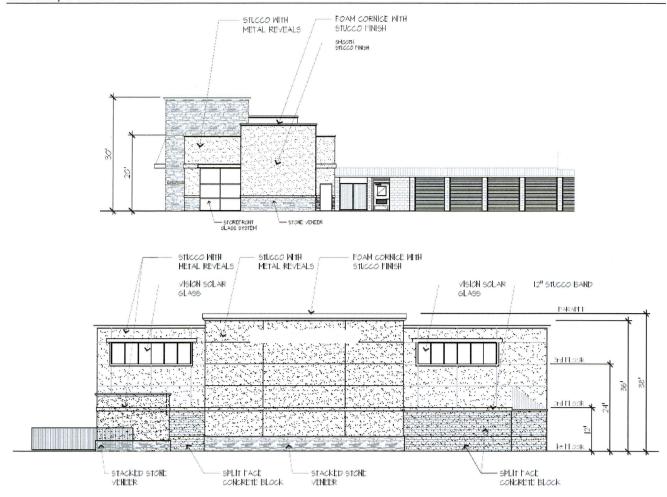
Self-Storage Building B south elevation, top. West elevation bottom.
